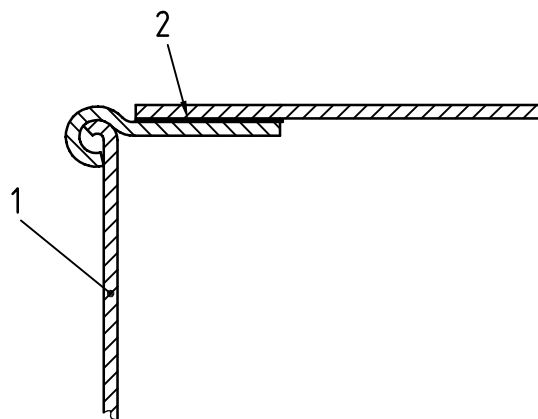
Typical arrangement of acoustic insulation showing cladding and end cap
